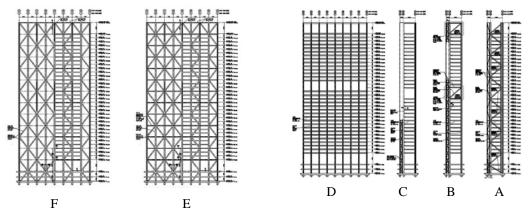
Building Frame Elevations (Refer to figure 5c.)
